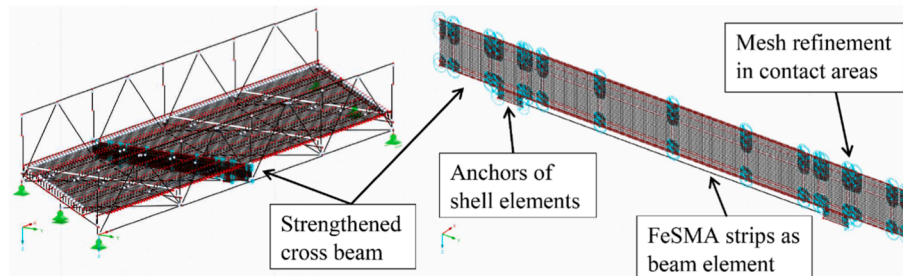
Details of the anchorage system used to attach prestressed Fe-SMA strips to the bridge girder.
